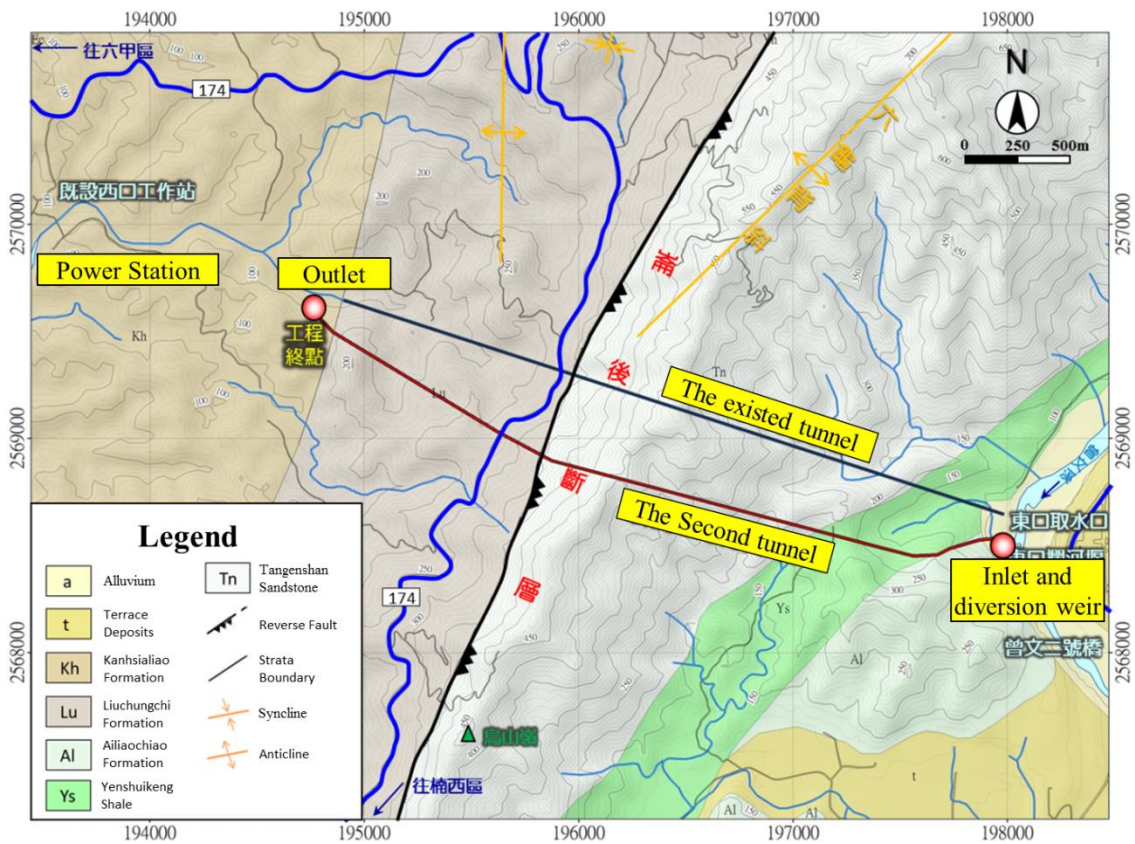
The engineering geology layout of Wu-Shan-Ling Second Tunnel.
